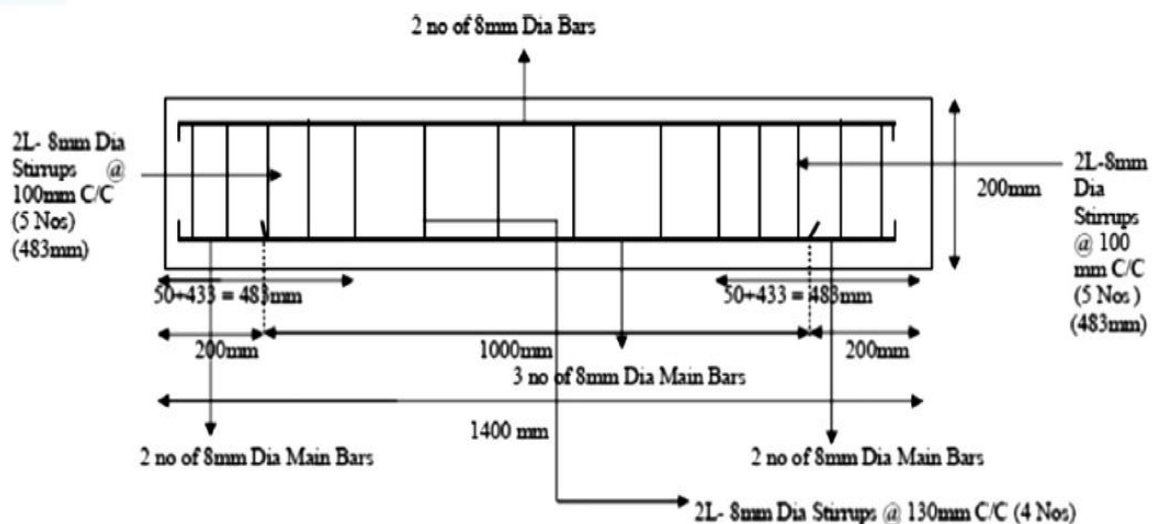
1: Reinforcement detailing of the beam (Sen, Reddy, 2013)
